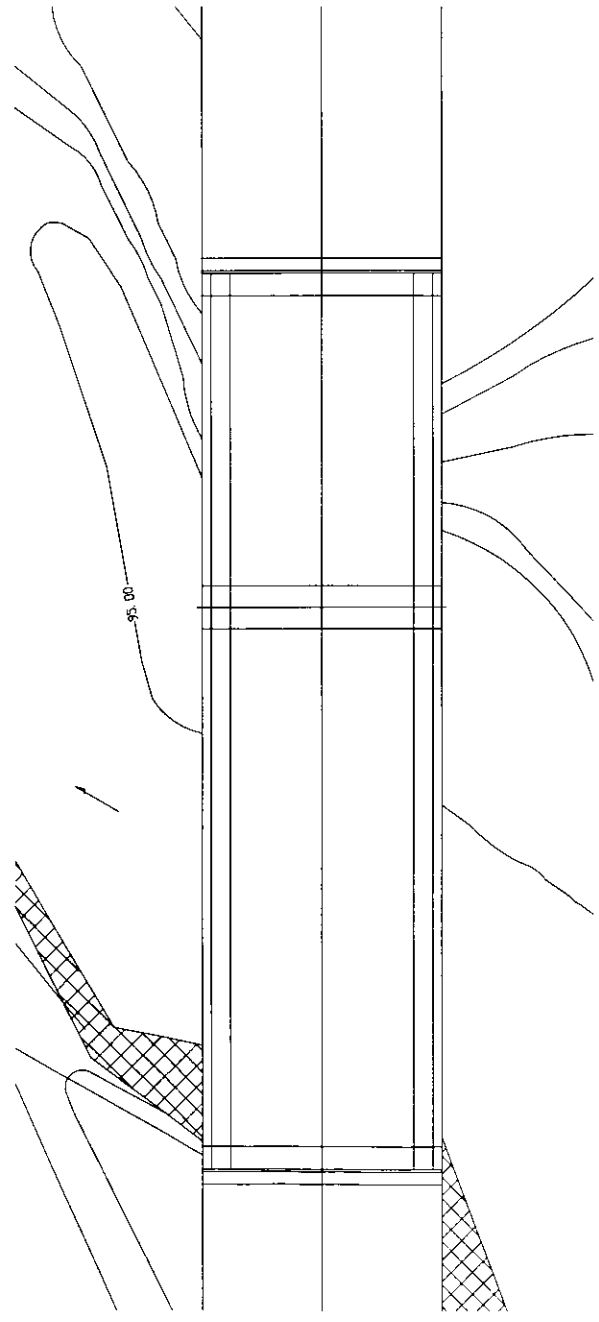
CA-04-04 MANGLIG BRIDGE (STRUCTURAL DRAWING)
